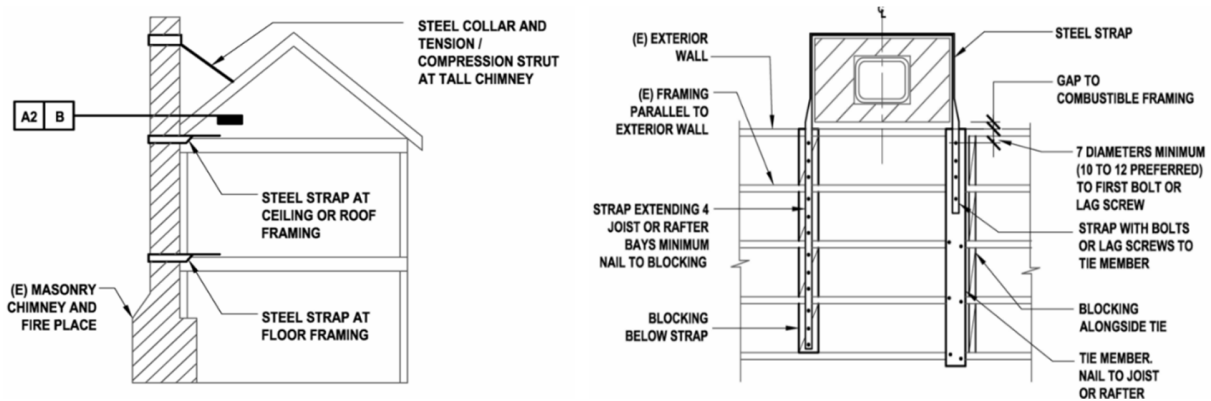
Bracing of masonry chimney along its height FEMA 547 [11].
